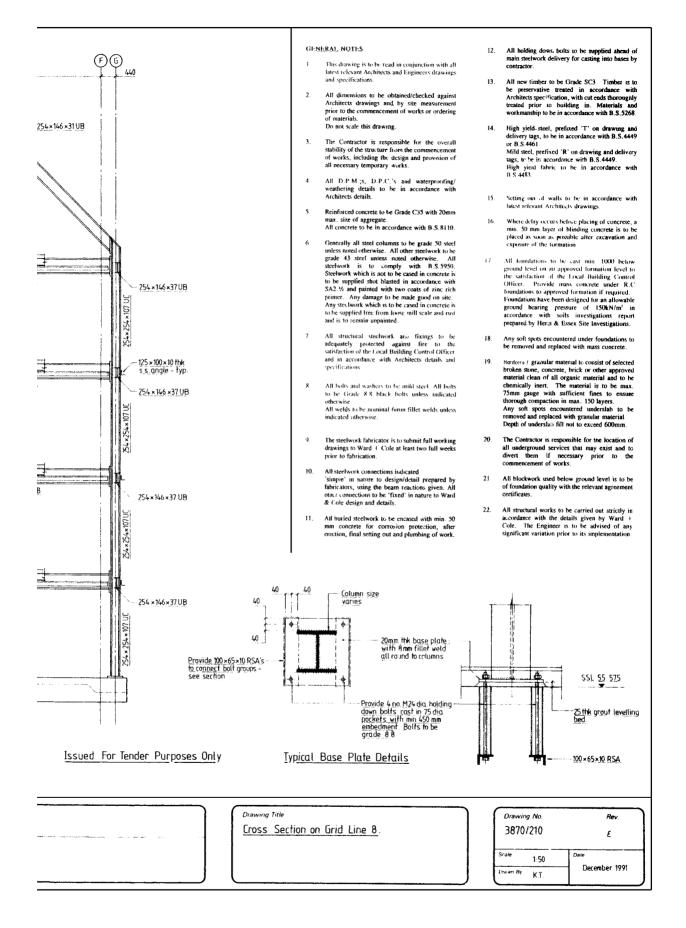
Structural elevation and details of a typical steel building frame
